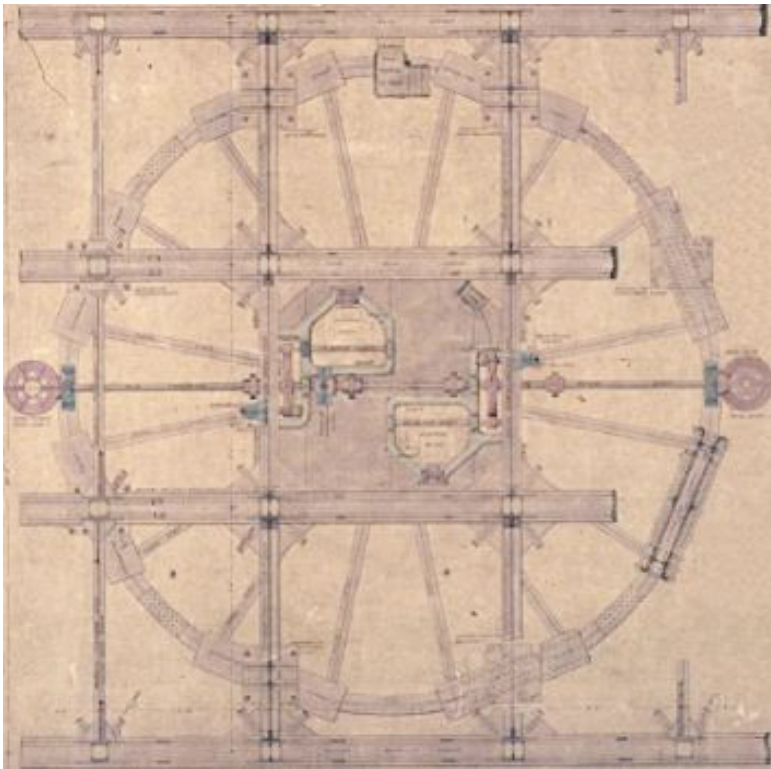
The slewing motors and the spur wheel mounted on the main slewing shaft
